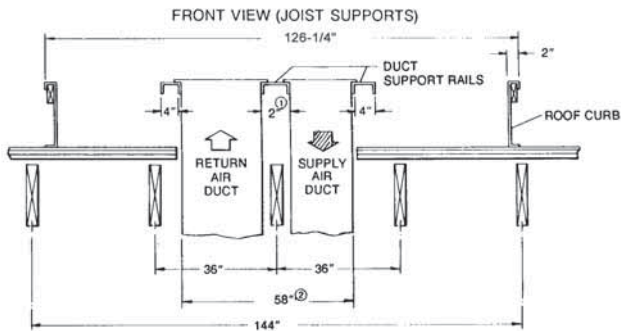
ROOF CURB DUCT OPENINGS DIMENSION
